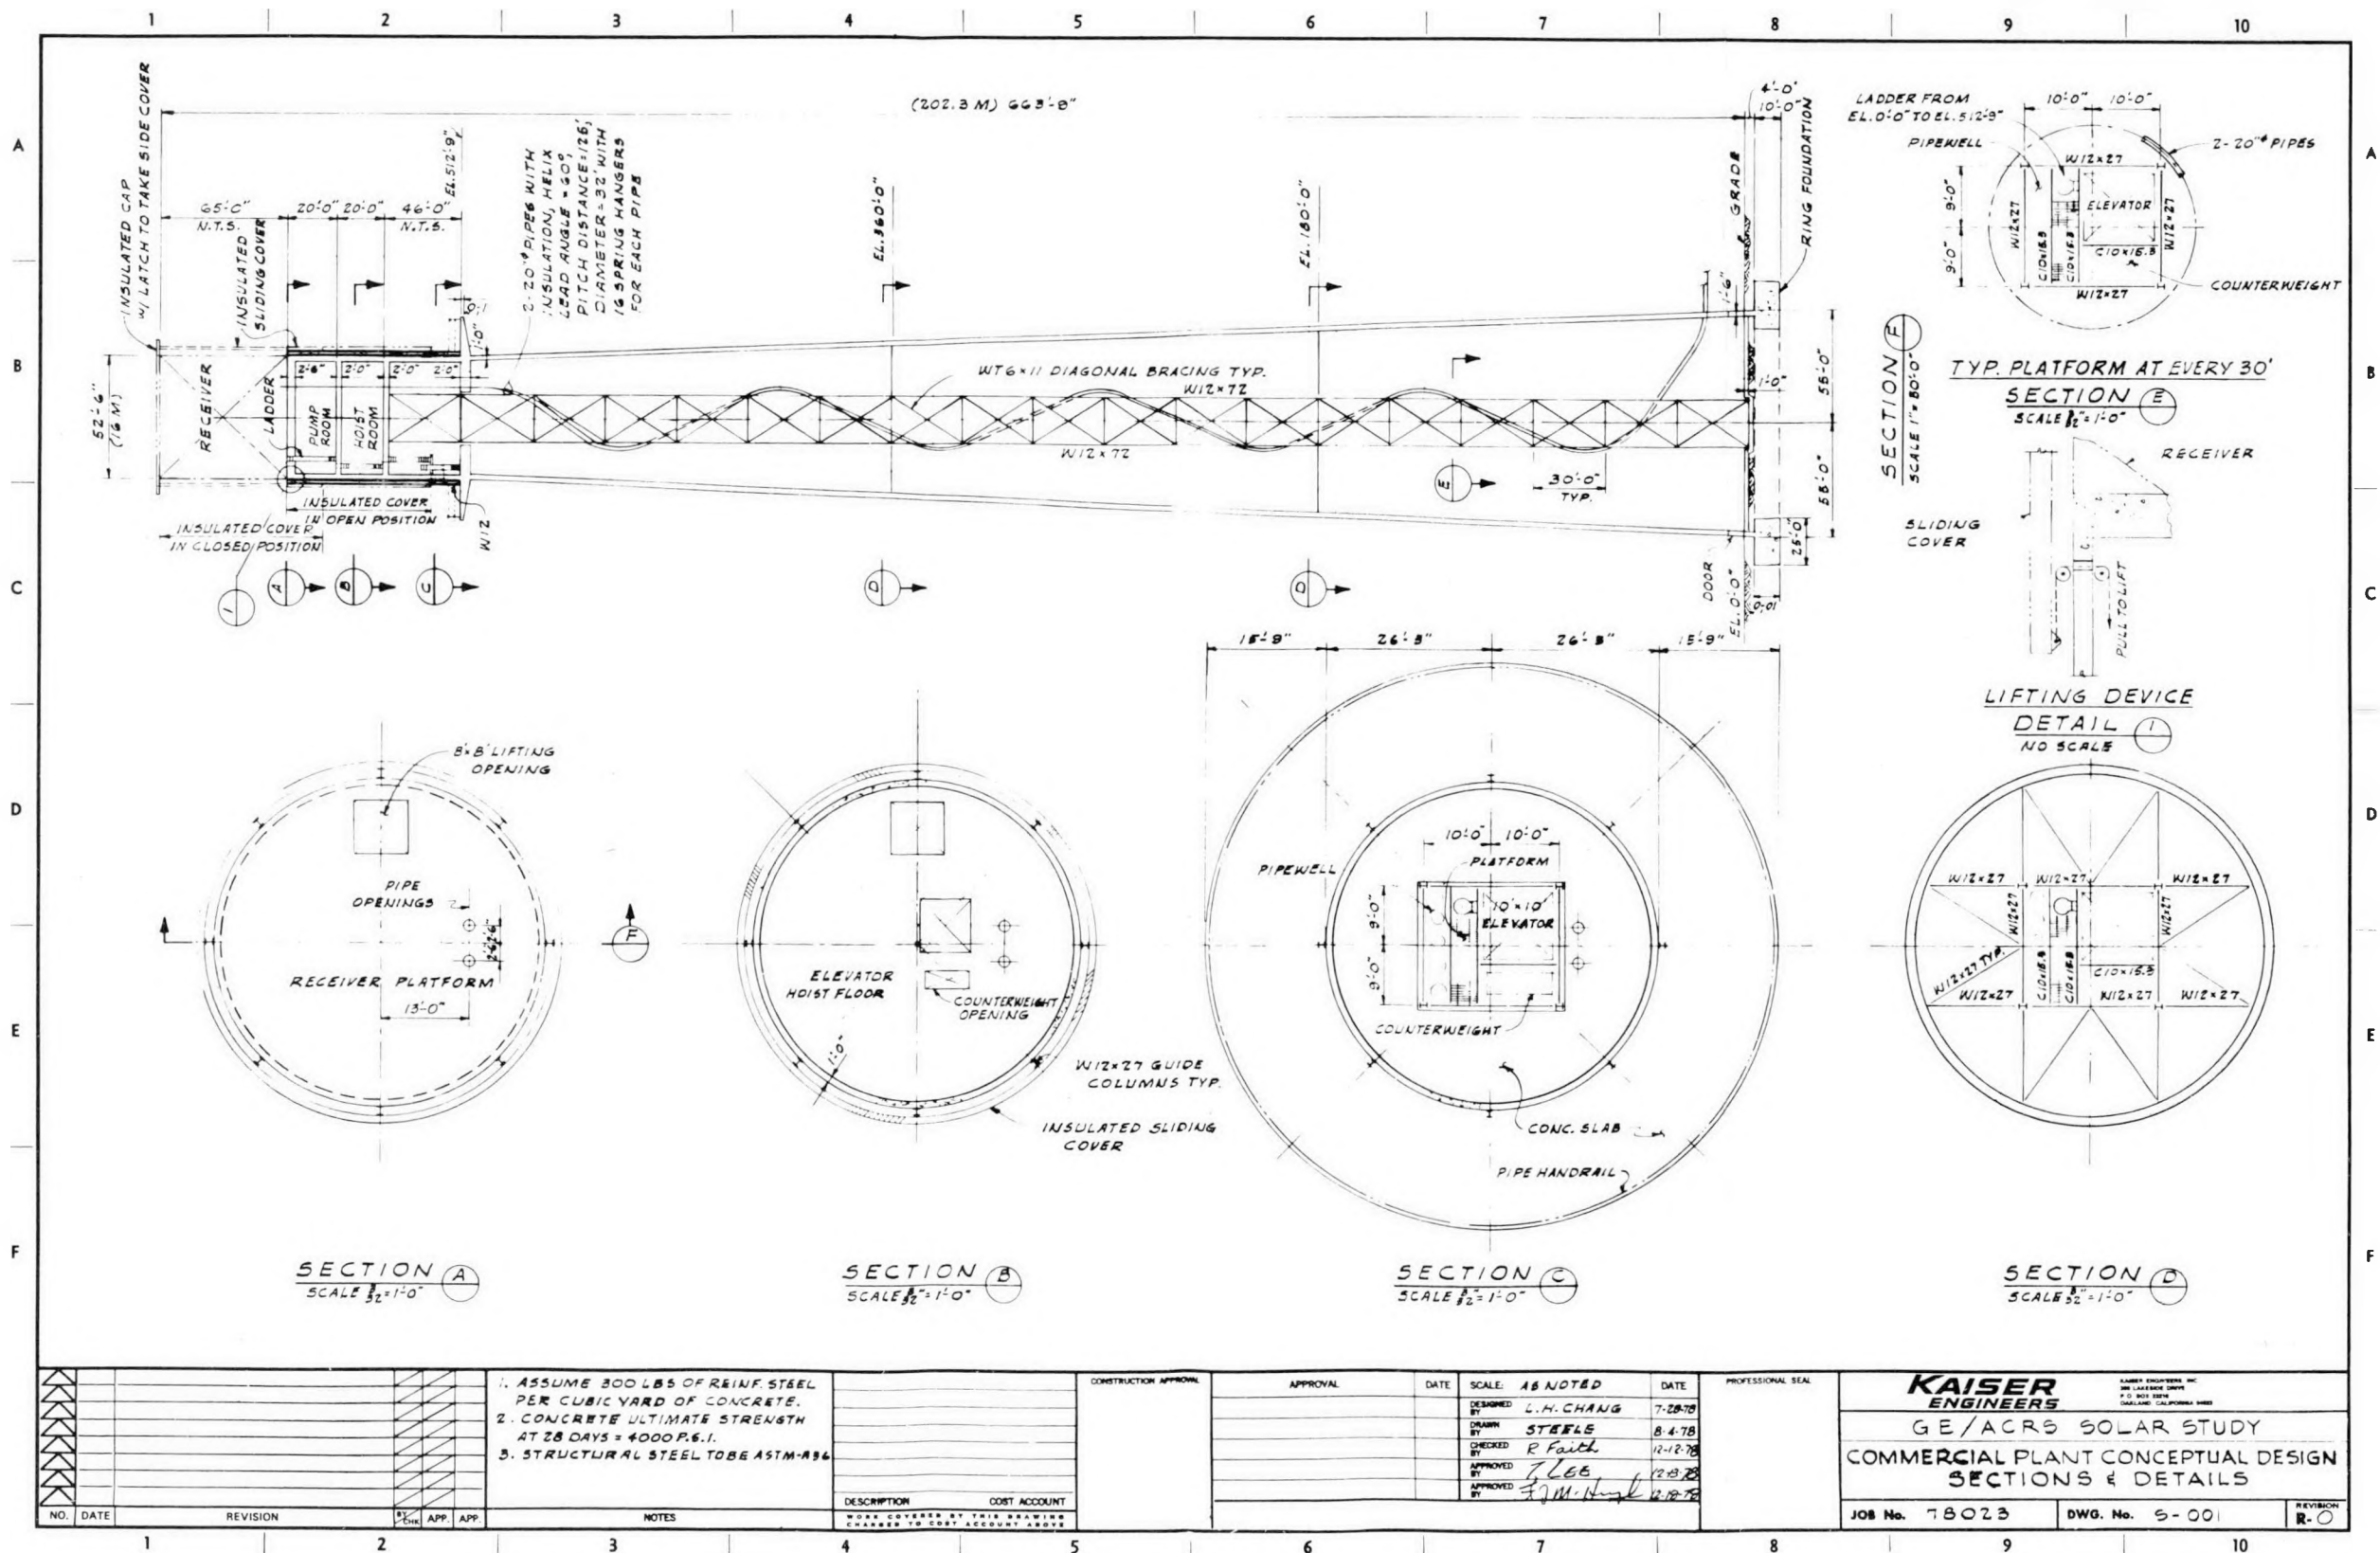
Receiver Tower Conceptual Design - Sections and Details
